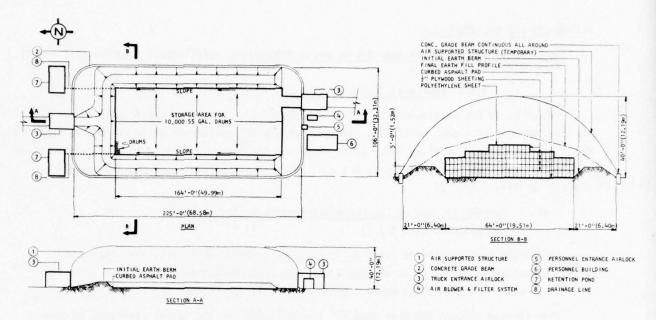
Plot Plan and Section View of the Outdoor Storage Facility for Low-Level Transuranic Wastes
